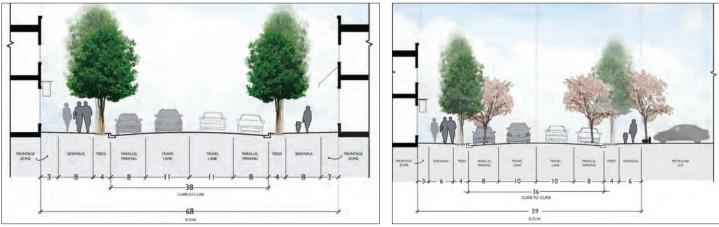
PROPOSED TYPICAL CROSS SECTIONS
